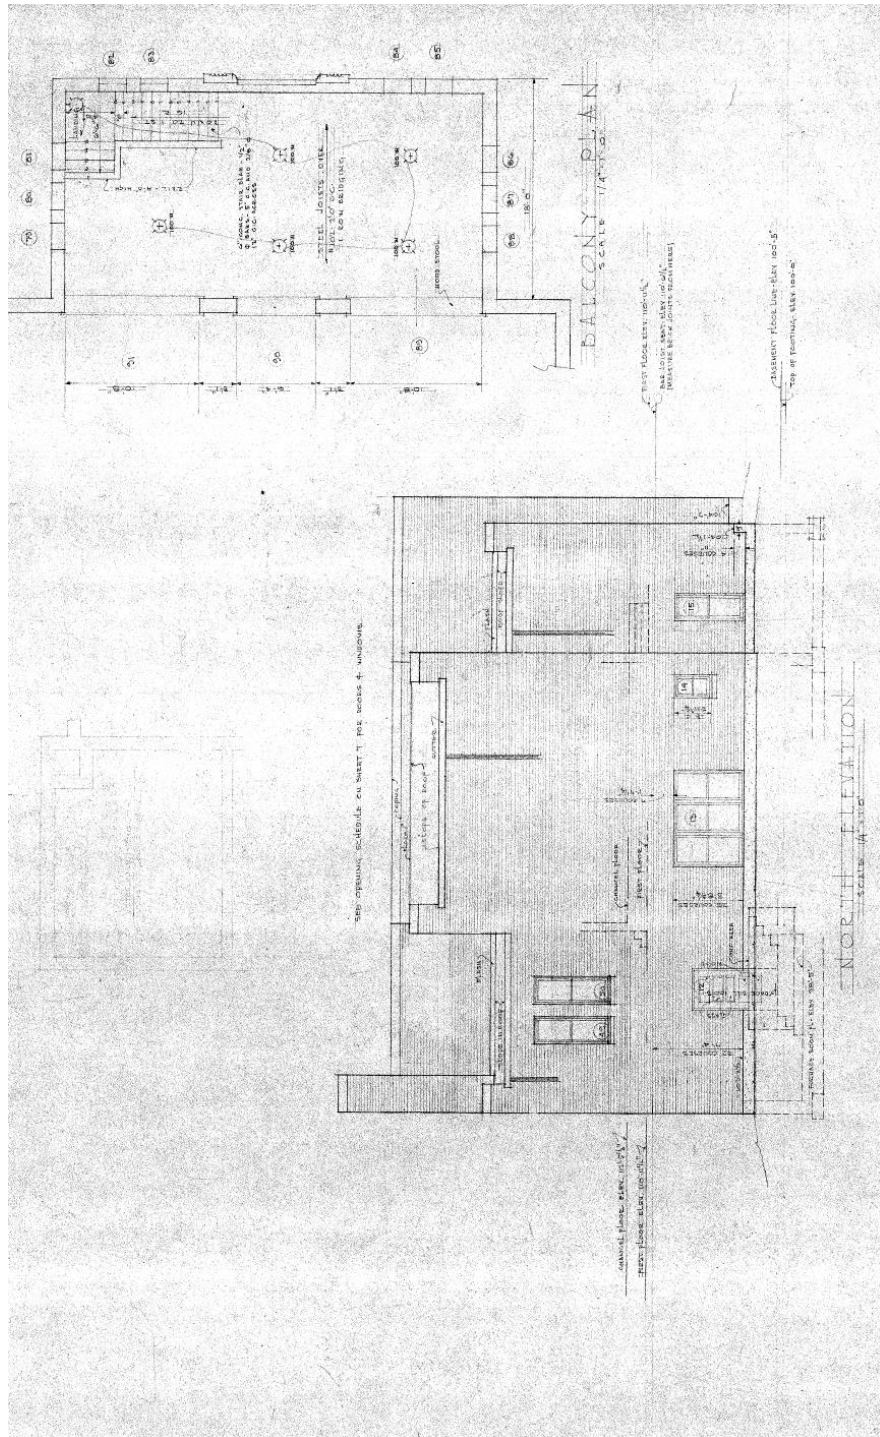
North elevation plus choir loft from plans drawn by David B. Toenjes.
